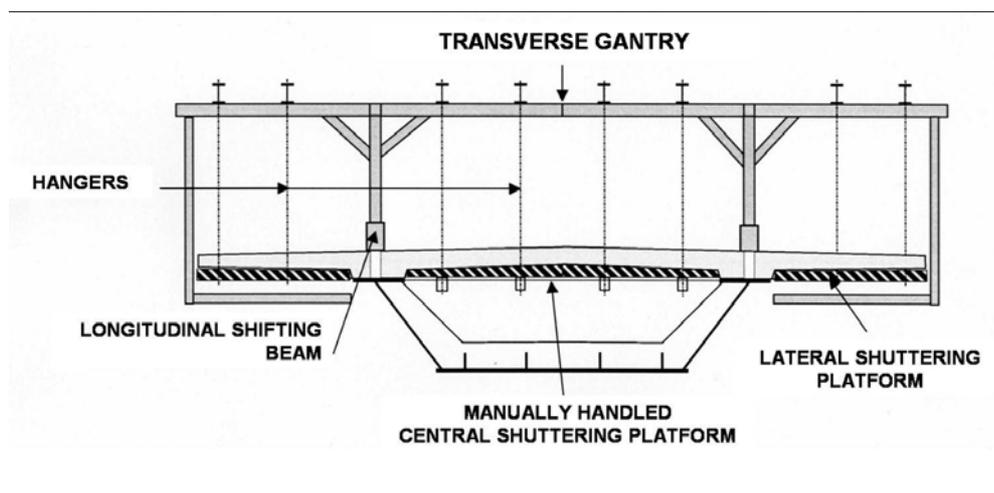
Mobile formwork for a twin girder bridge incorporating directly supporting cross-beams without cantilevers
